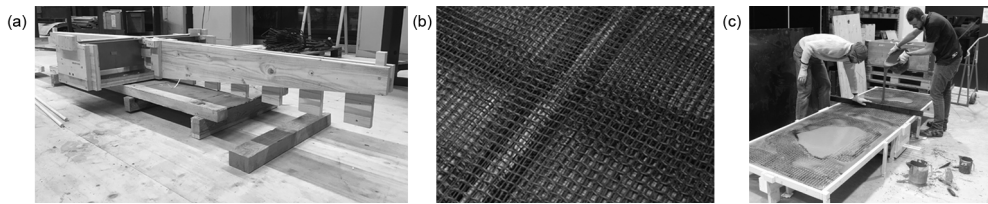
Construction: (a) formwork; (b) reinforcement; (d) casting.
